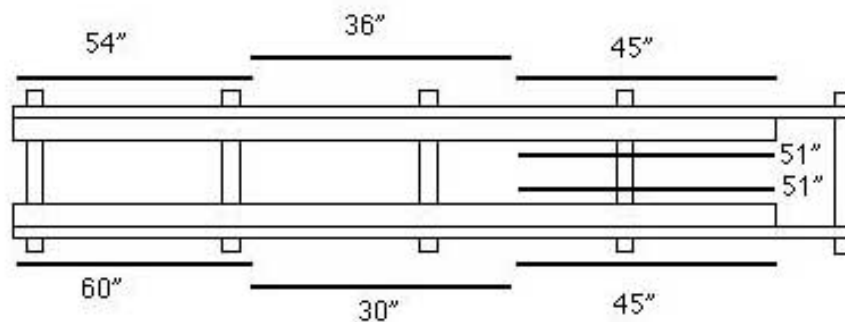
Exploded Overhead View of SHORTRACC Base Showing Rip Plate Lengths (NOT TO SCALE).
